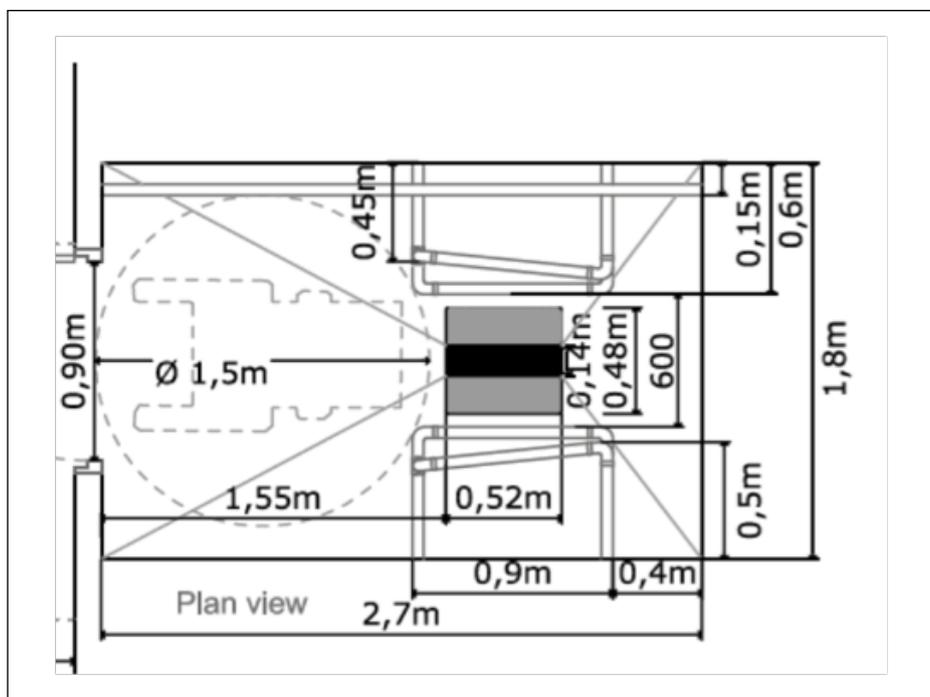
Floor Plan of Accessible pit latrine (UNAPD, 2010)
